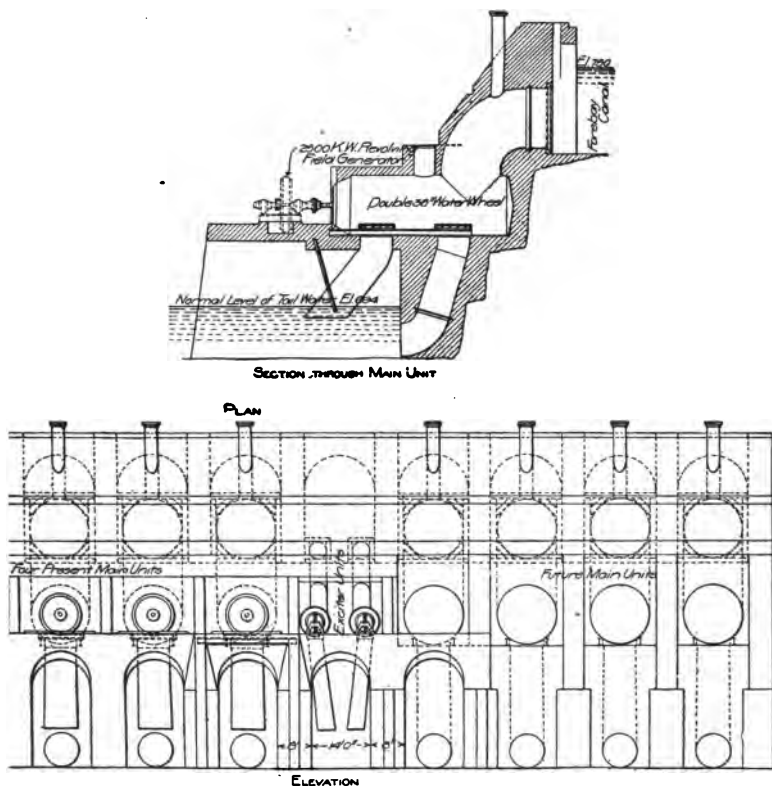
ELEVATION AND SECTION OF POWER-HOUSE.
